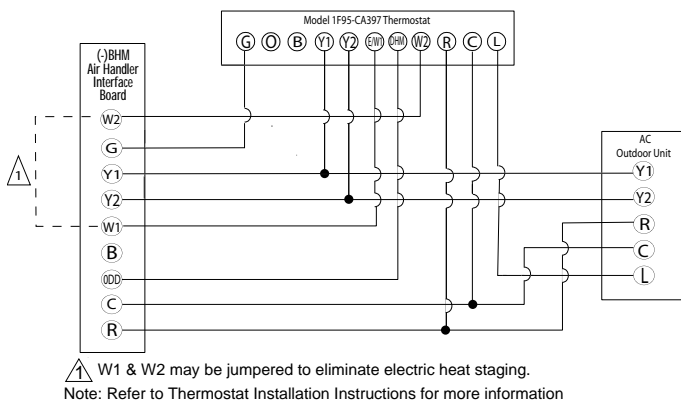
shows typical system wiring of 16 SEER condensing units with gas furnaces or air handlers. Reference Table 8 for an explanation of the control wiring symbols. Refer to the particular furnace or air handler installation instructions for additional system control wiring information.
